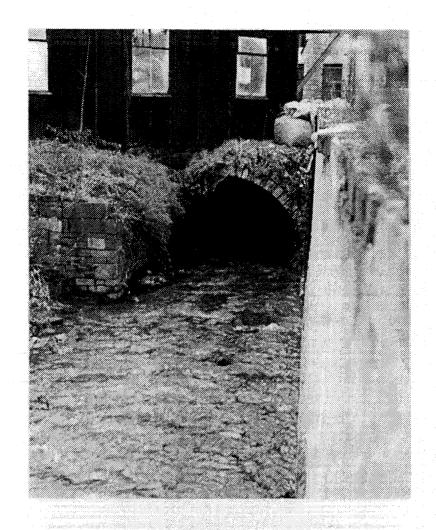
CULVERT No.27 (Inlet above - Outlet below)
